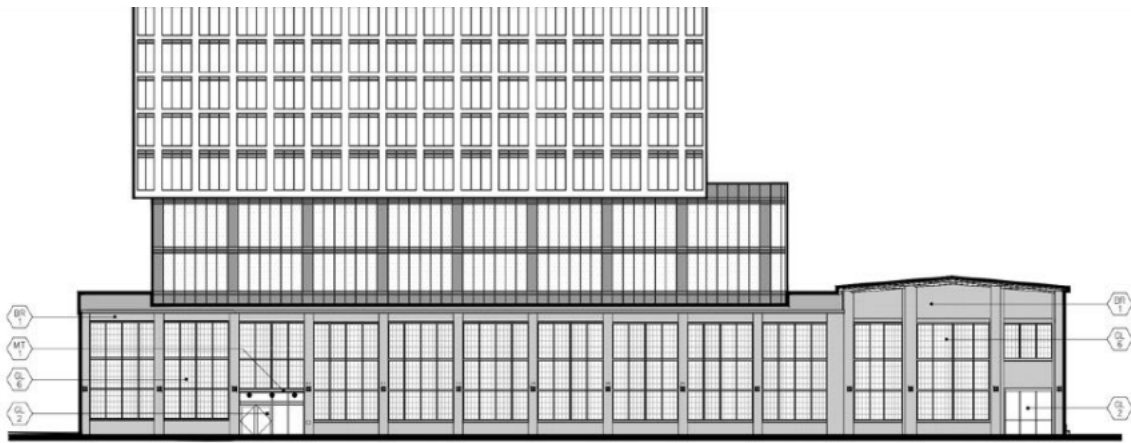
Proposed south elevation of 185 Eastern Avenue (Machine Shop building) (Core Architects Inc., 2026).
